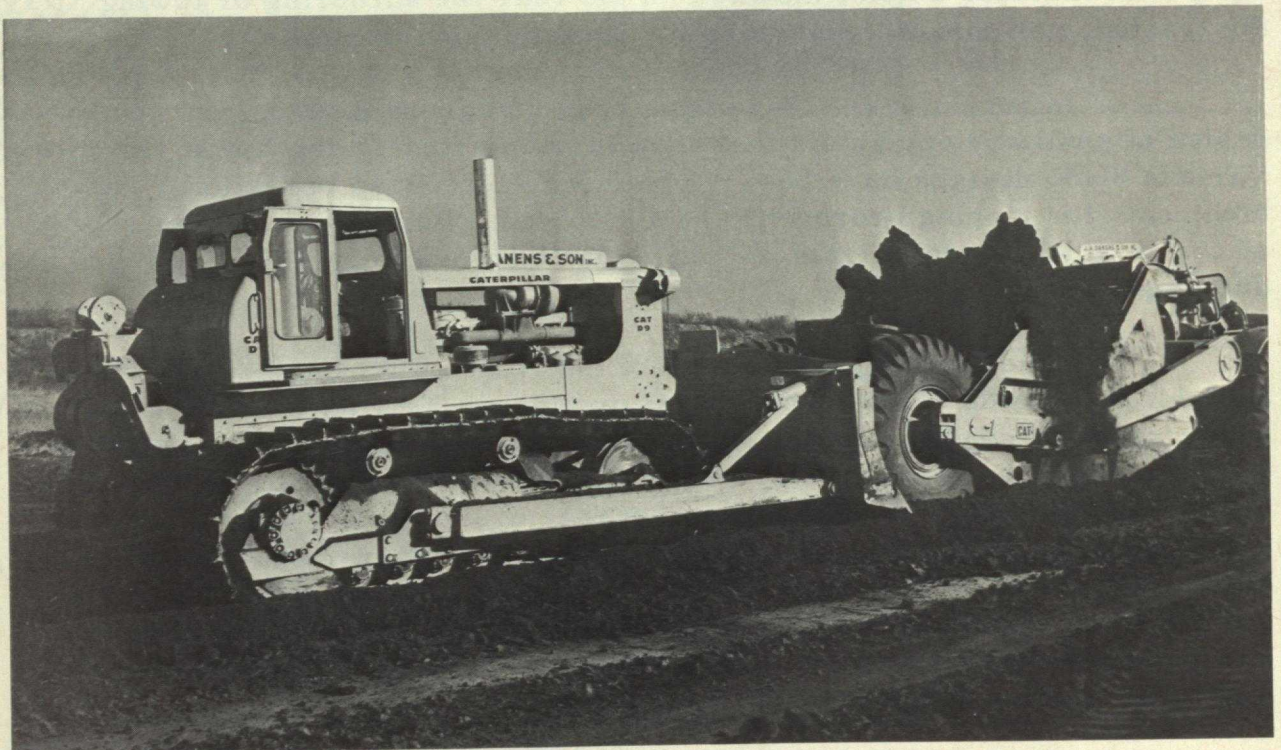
Scraper stripping overburden, tractor pushing. (Courtesy Crothers)
